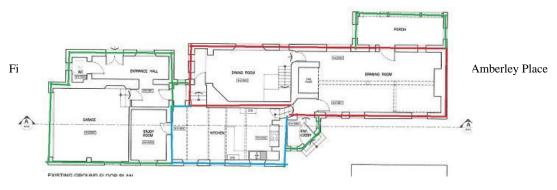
Ground Floor Plan of Amberley Place, showing the historic progression of the dwelling
